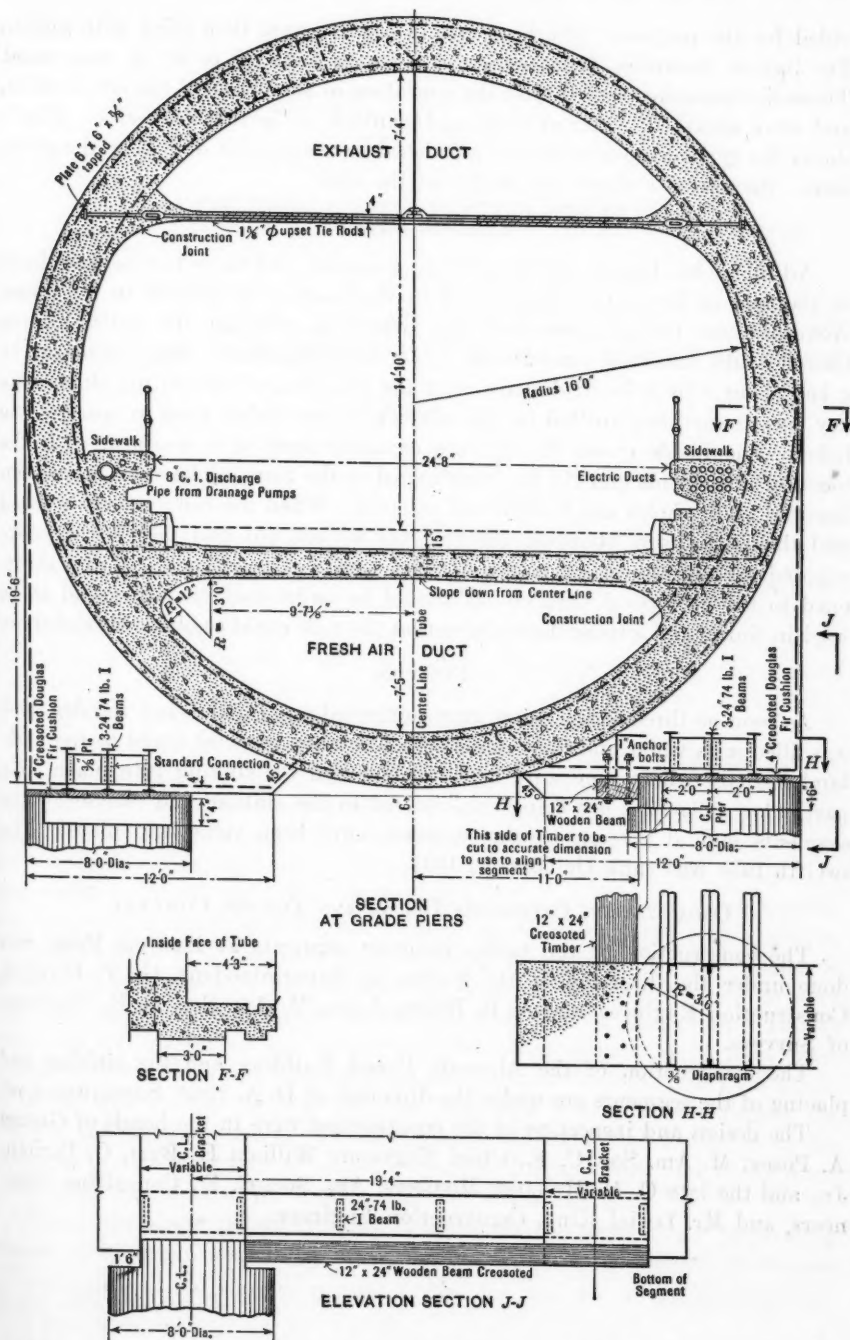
TYPICAL SECTIONS OF PRECAST SEGMENTS.
